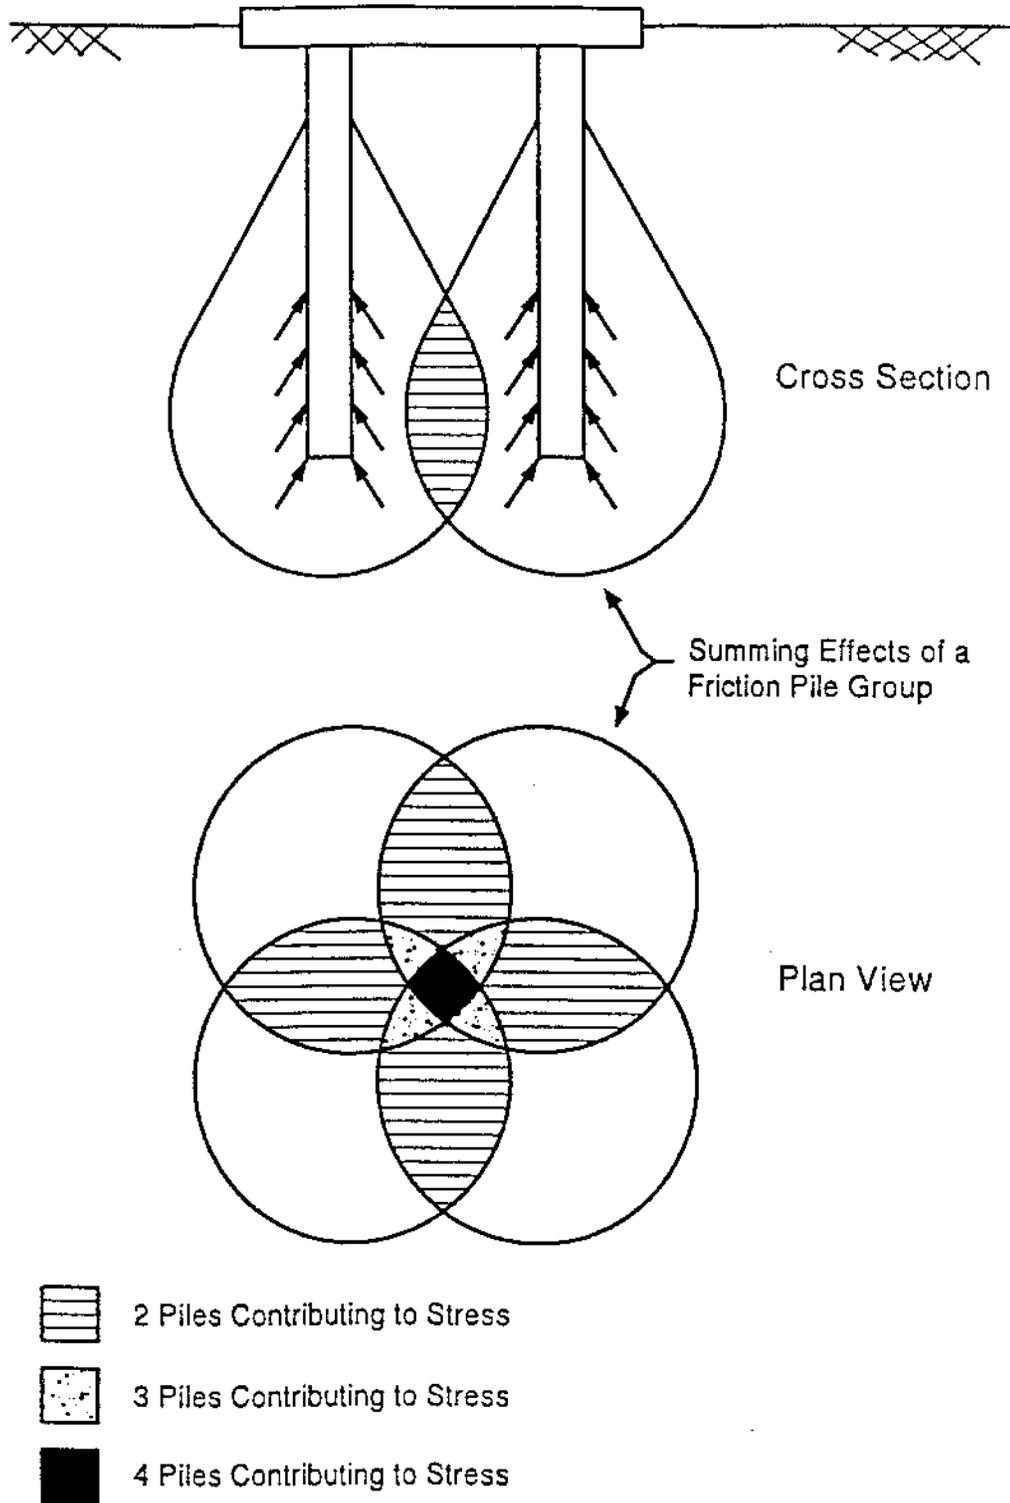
OVERLAPPING STRESSED SOIL AREAS FOR A PILE GROUP.
